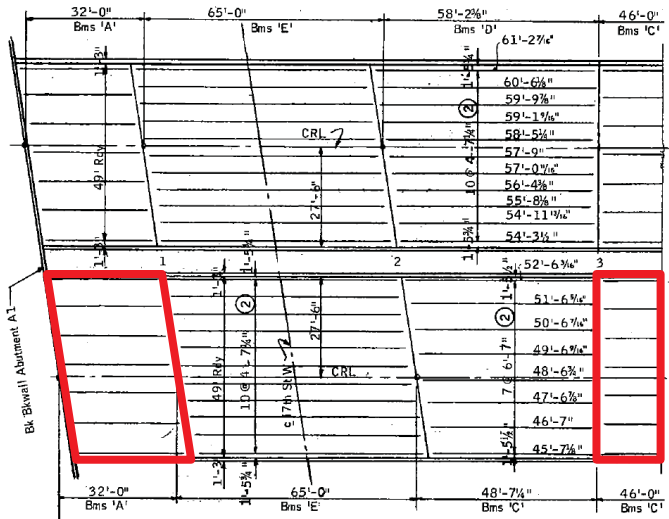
Location of beams A and C within the bridge section (extracted from the drawings provided by ODOT)
